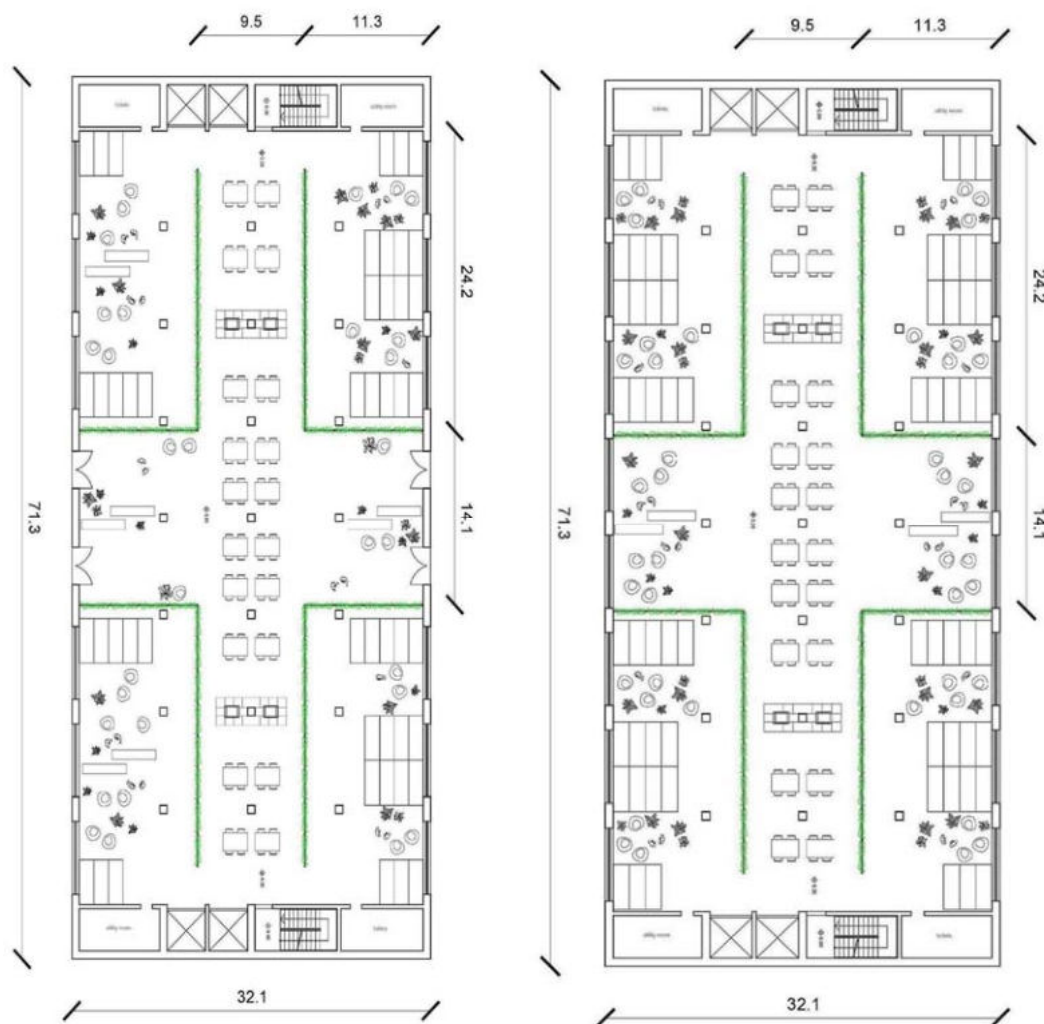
InFactory – Ground floor plans<sup>32</sup>
